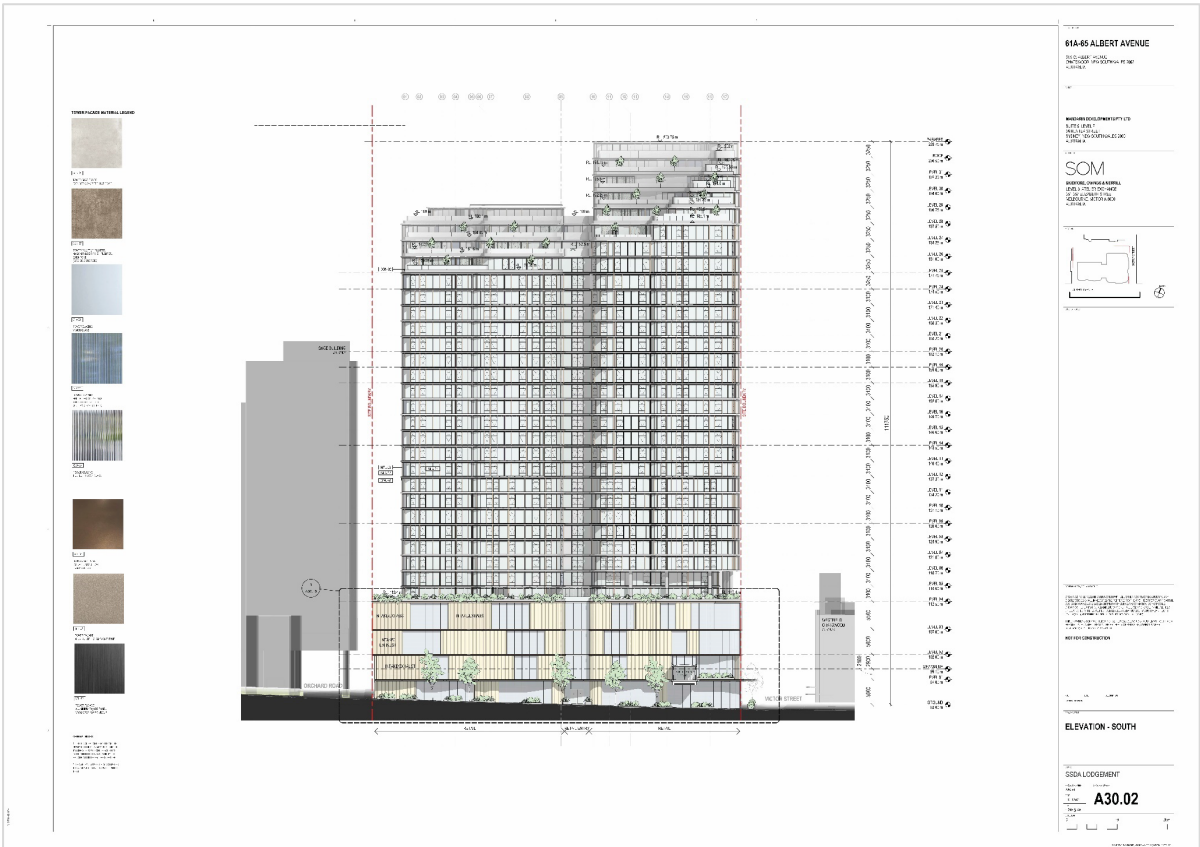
South-facing Elevation along Albert Avenue. (Source: SOM. 2025)
